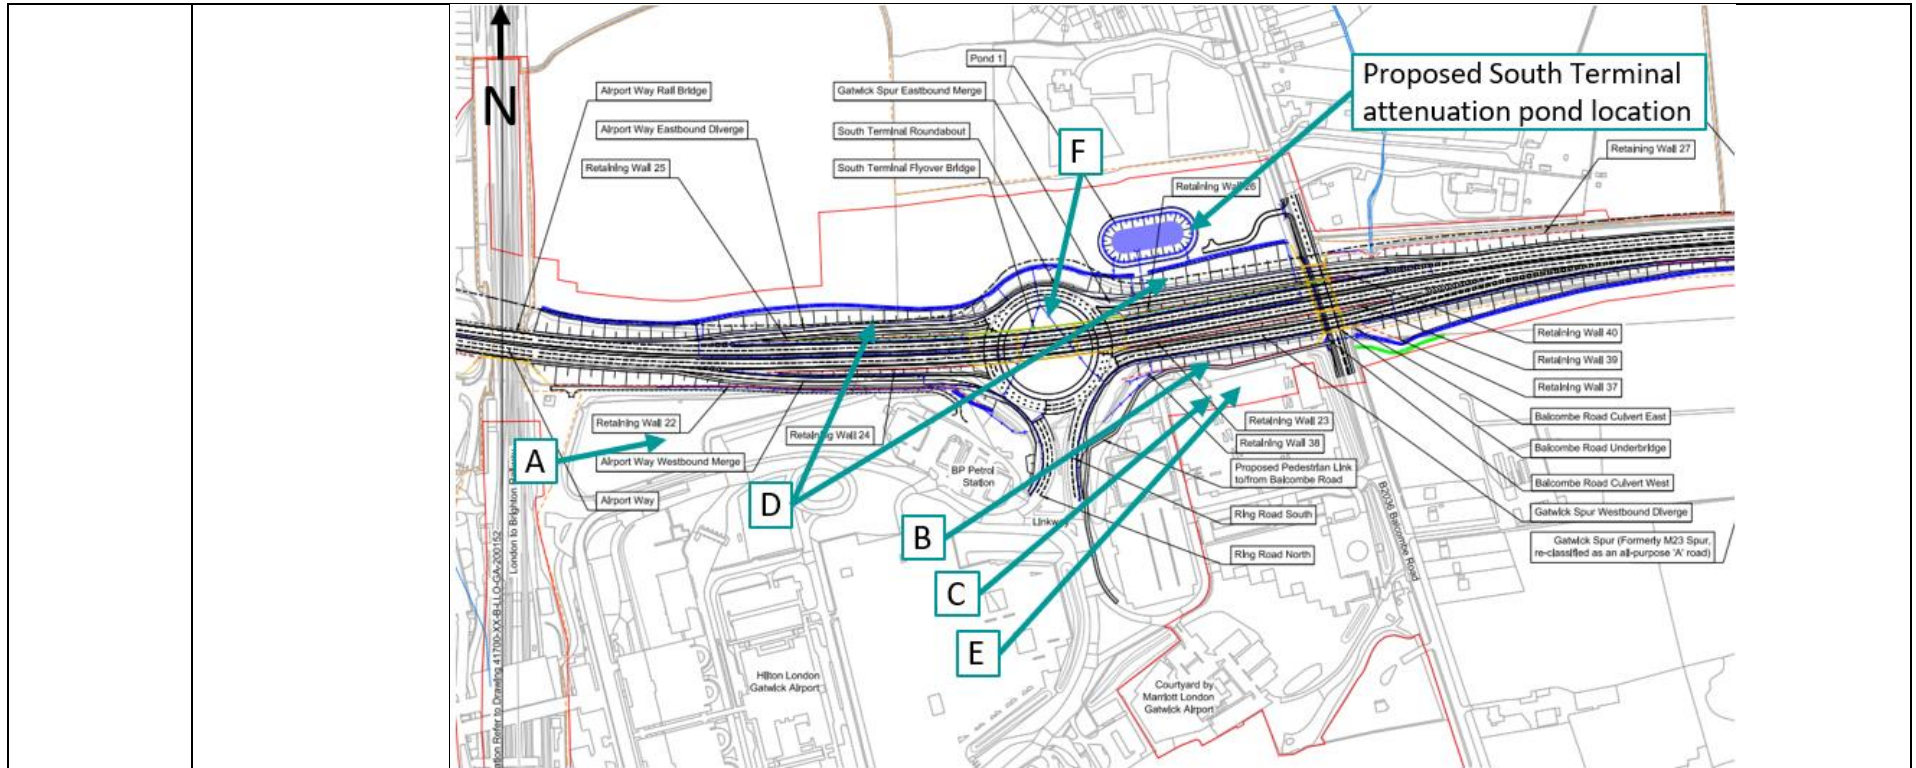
Potential Alternative Drainage Attenuation Feature Locations overlain onto extract of Surface Access General Arrangement Plan
